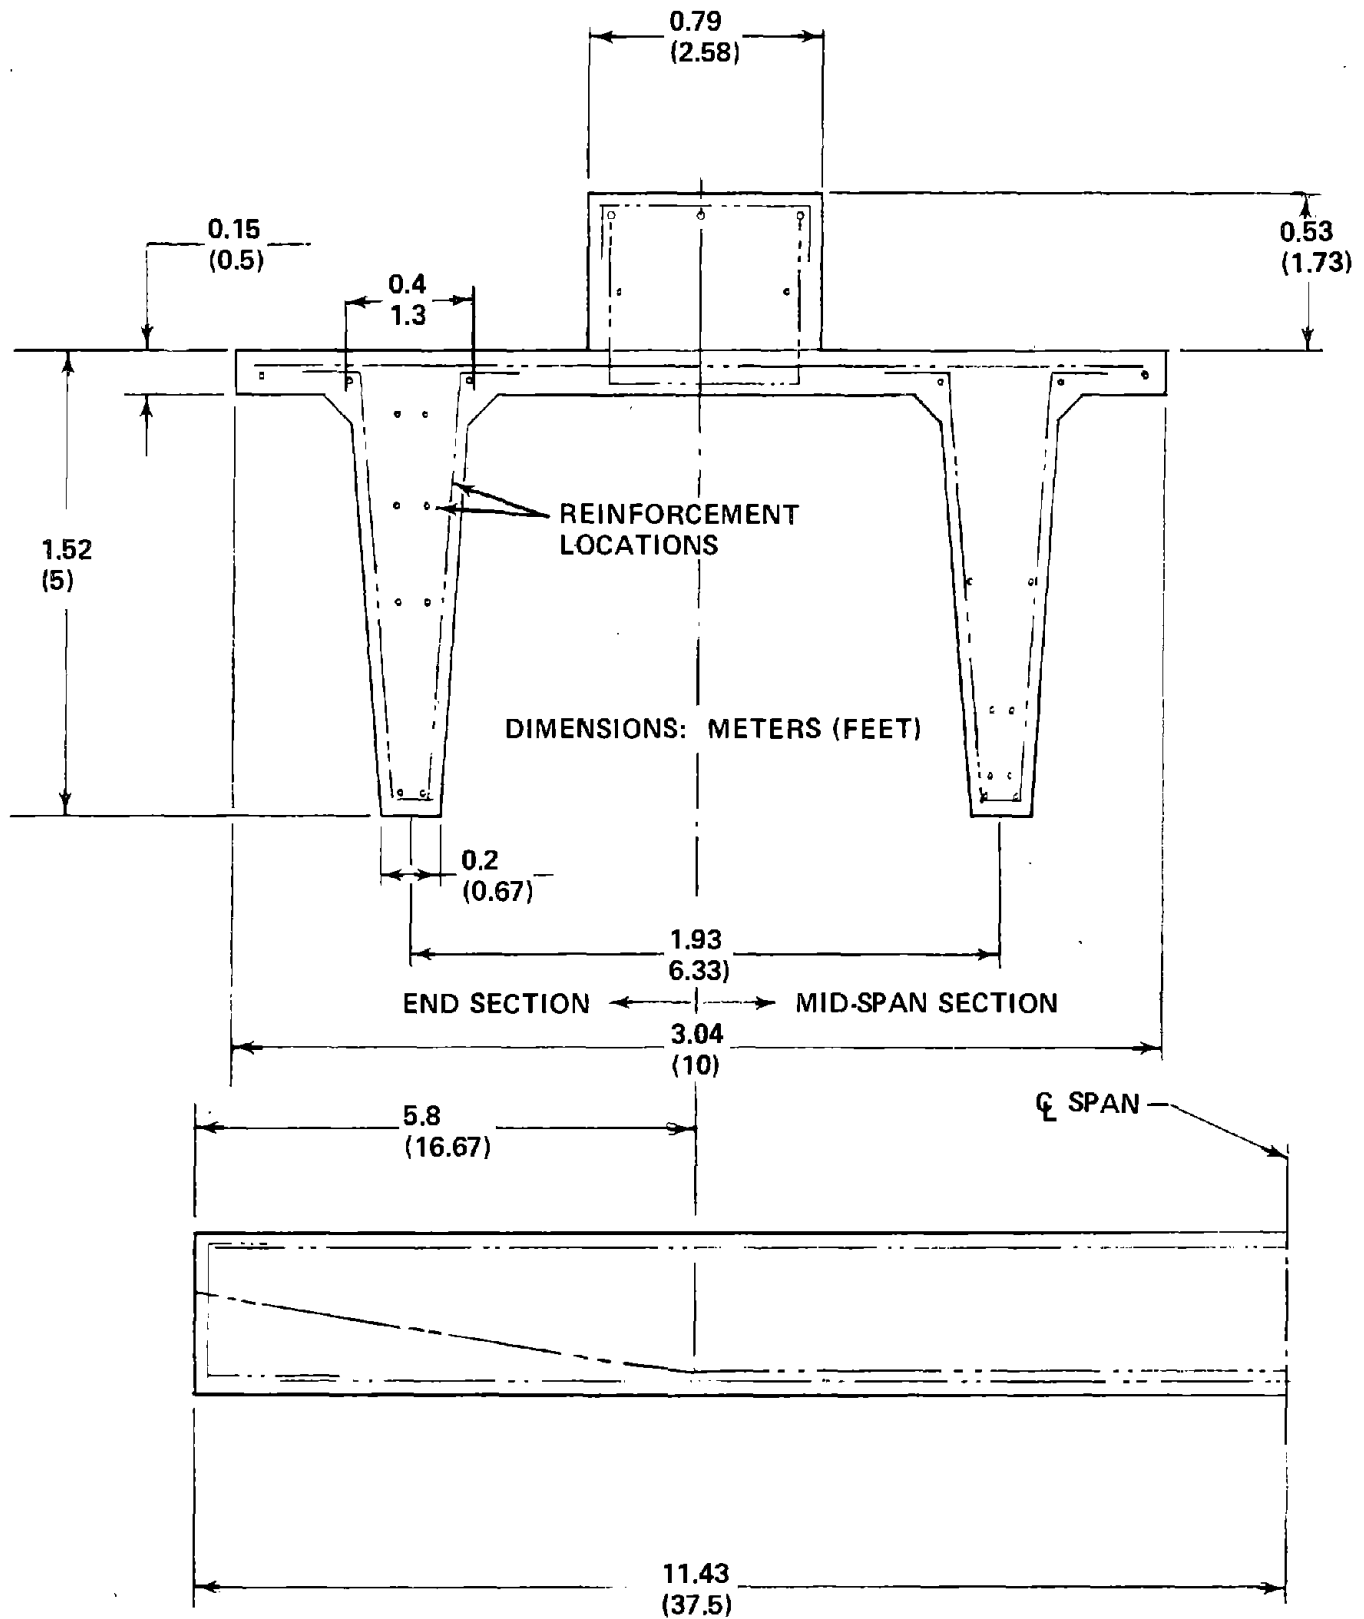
DETAILS OF 22.8 M (75 FT) SPAN - DOUBLE-TEE GIRDER
